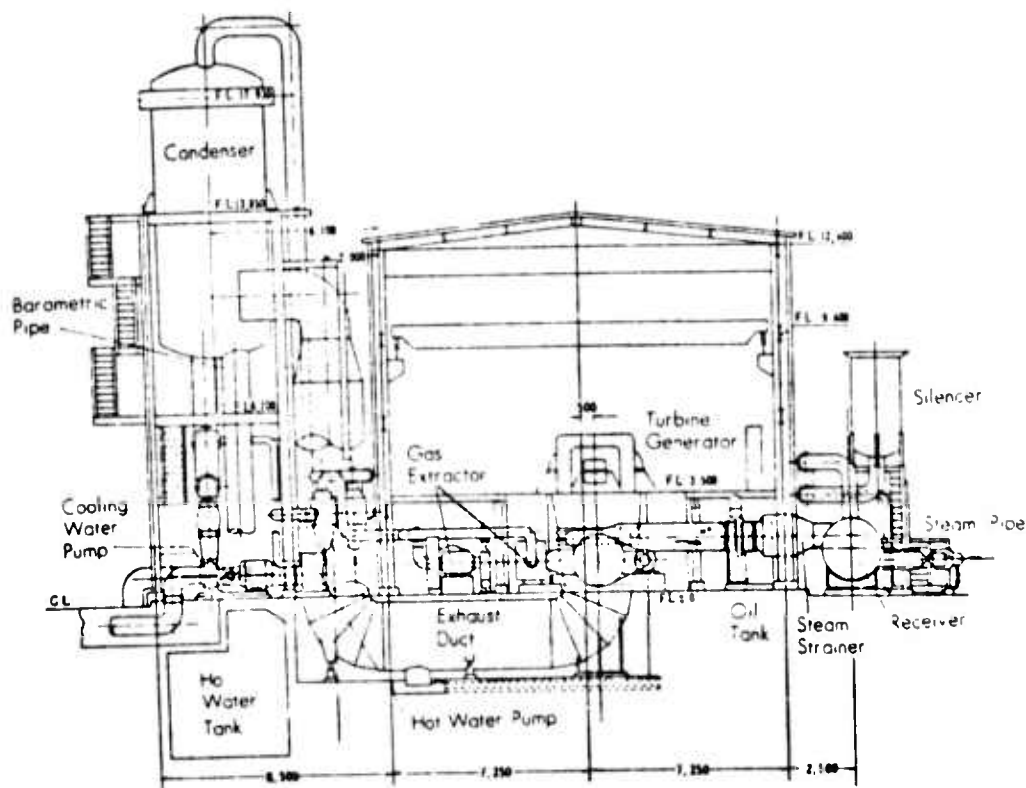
Cross section of Otake power plant (dimensions in m) [205] .
